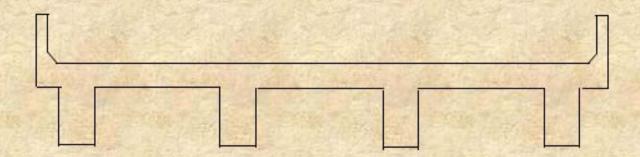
Monolithic Concrete Slab over Cast-In-Place Tee Beams.
